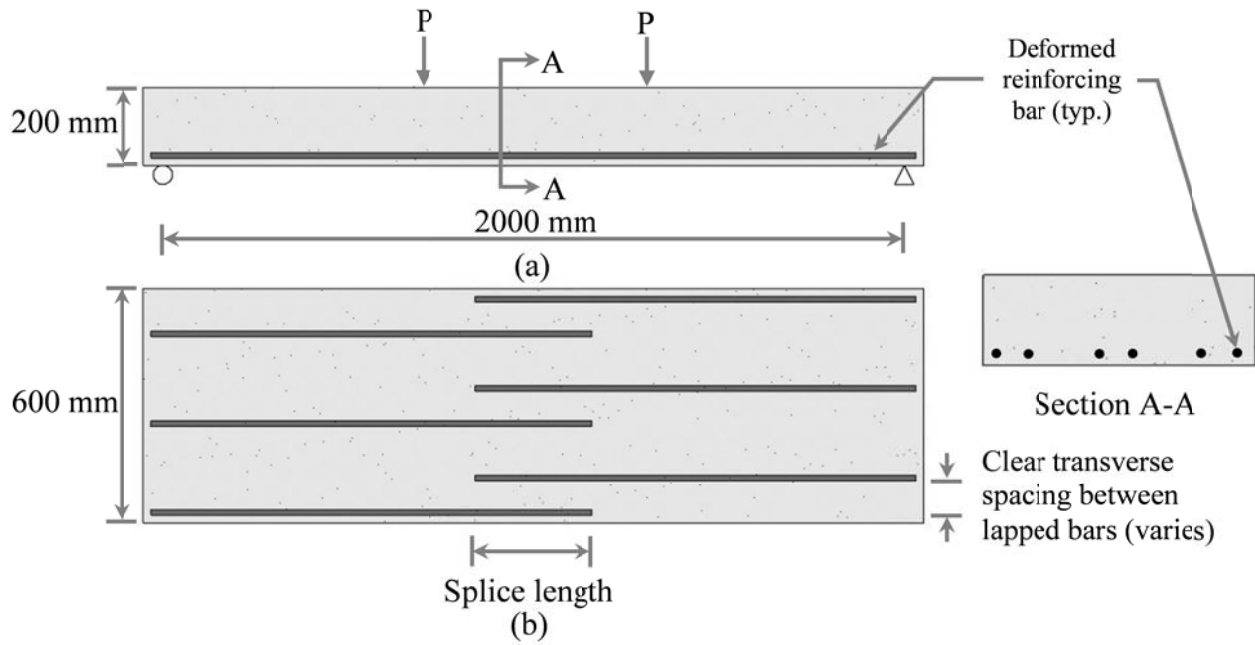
Full-Scale Reinforced Concrete Slab Specimens (Hamid & Monsour, 1996): (a) Elevation, and (b) Plan View.
